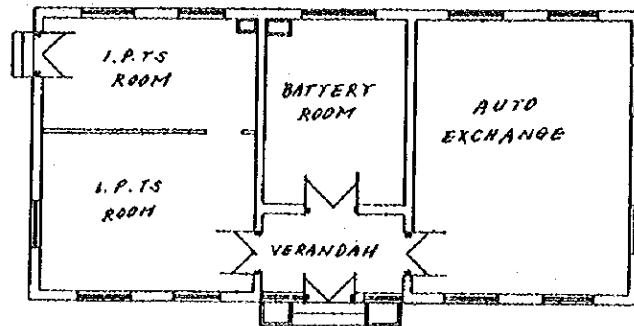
·2 Plan of Type C Dependent Exchange Building
